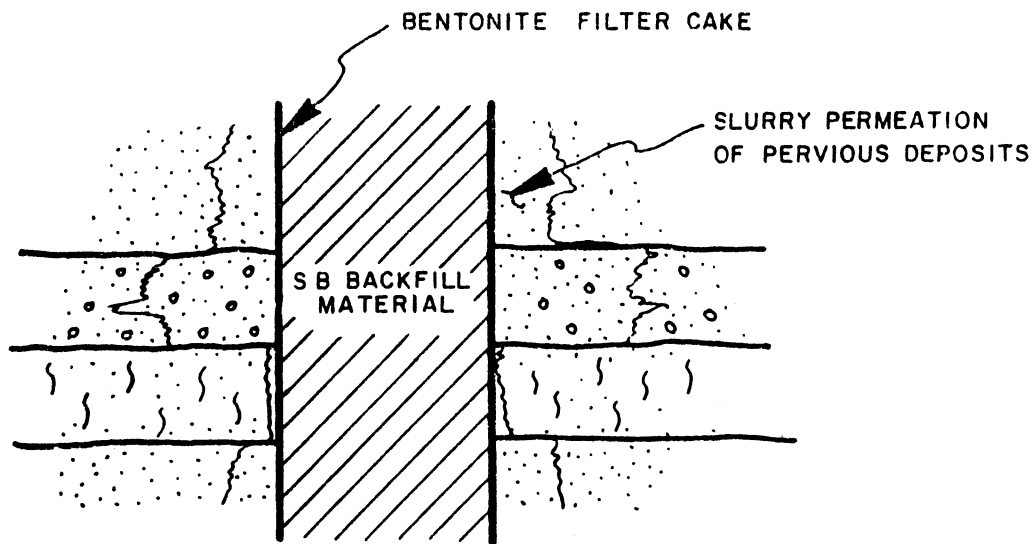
Schematic Cross Section of S-B Slurry Trench Cut-Off Wall (Source: D'Appolonia undated)
